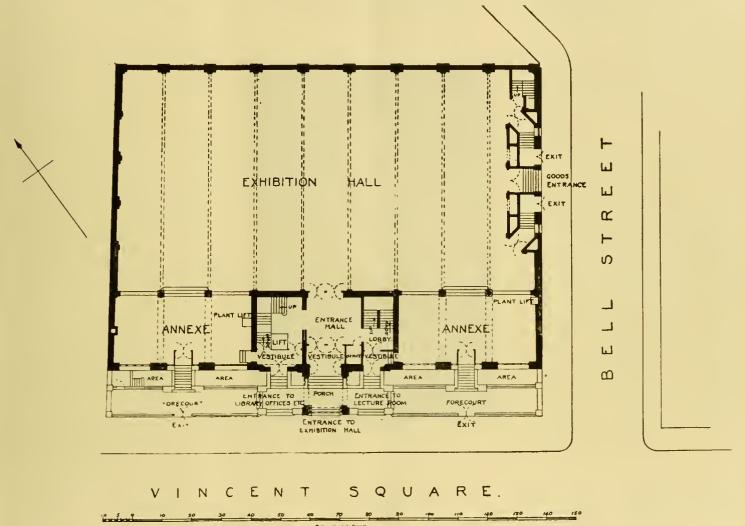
GROUND-PLAN OF THE ROYAL HORTICULTURAL HALL.
